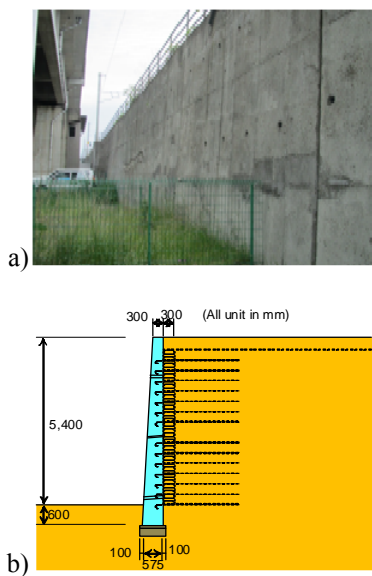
Geosynthetic-reinforced soil retaining wall have a staged constructed full-height rigid facing for Tohoku line (railway), next to Natori River bridge, Sendai City; a) a view in May 2011 (Okamoto, M.); and c) typical cross-section (by the courtesy of East Japan Railway Co.).
